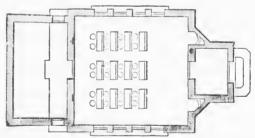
,-Ground Plan adapted to Designs in Figs. 64, 66, 67 and 68.
